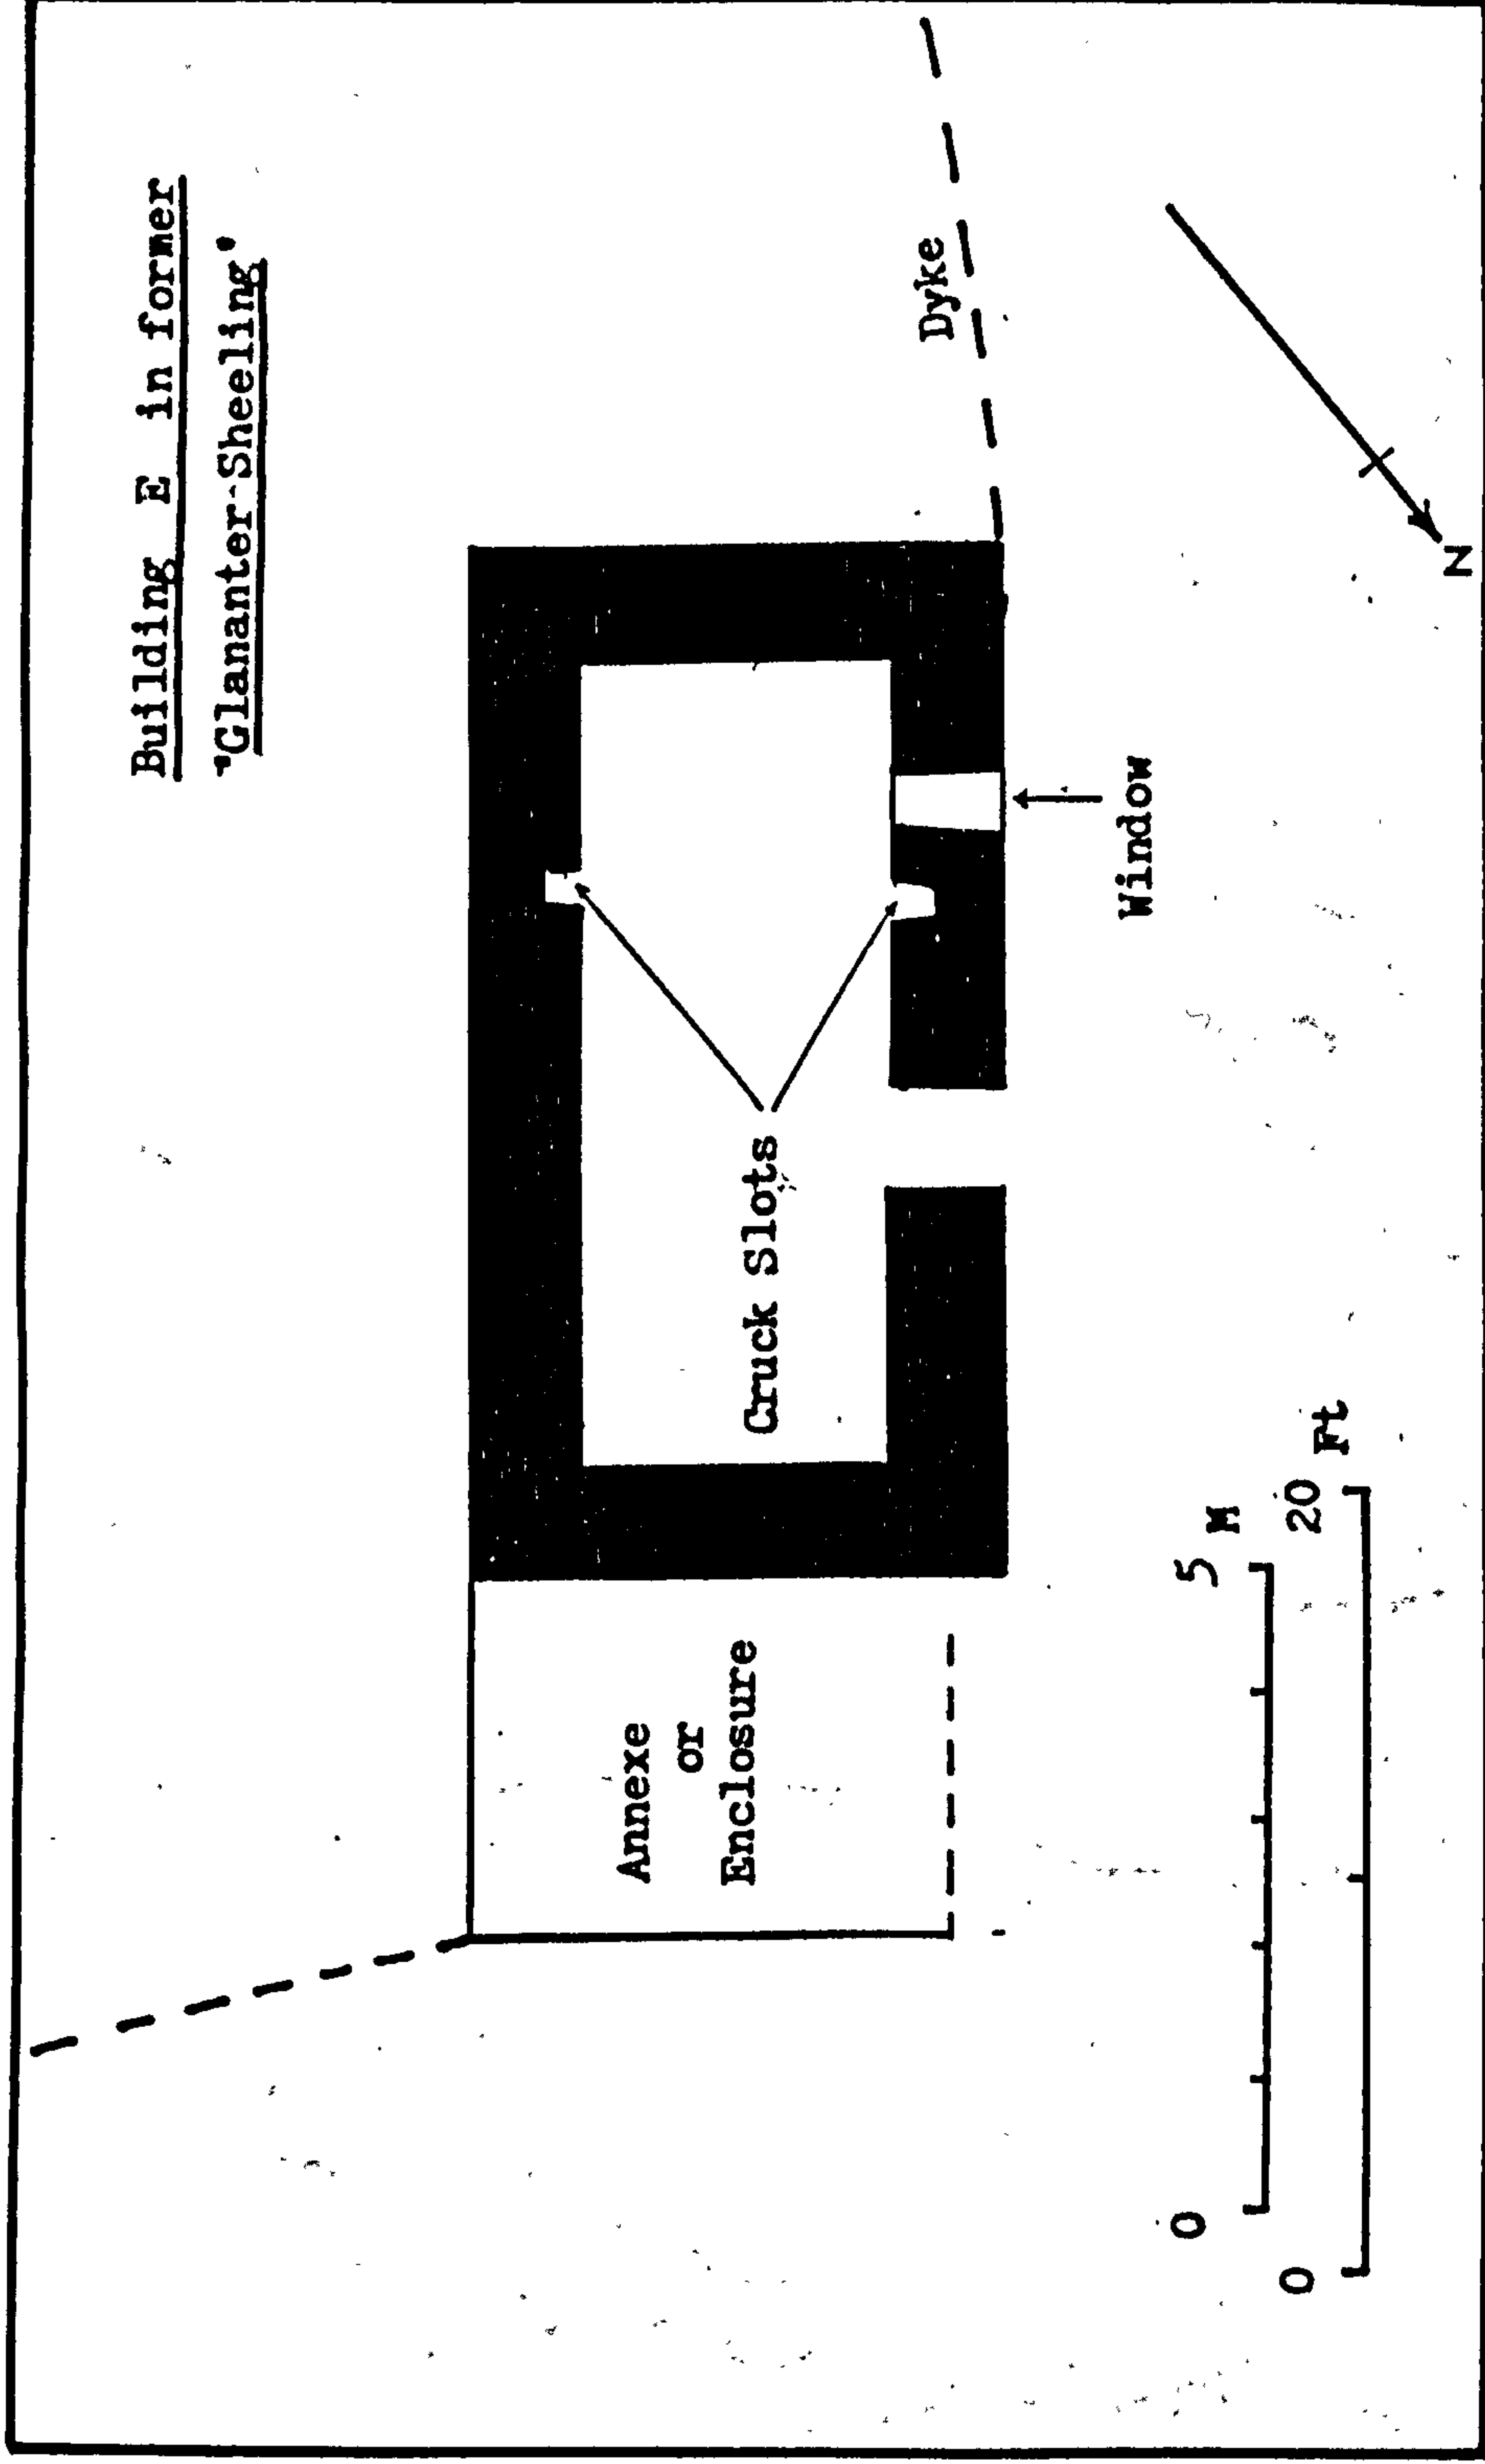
Building E appears to have been one of the earlier structures on the former sheeling (Figure 69). It is entirely dry-stone built, with one lower cruck piece still in position (see photographs).
